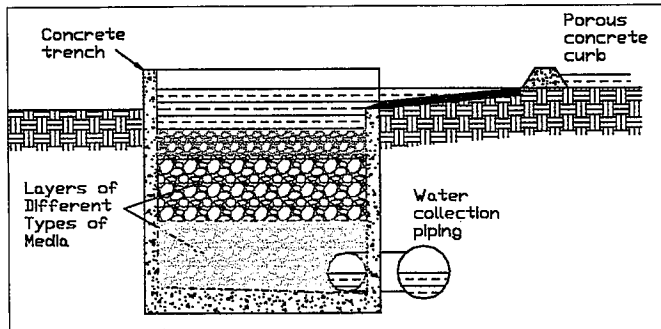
Cross-section of Storm Water Runoff Treatment System.
